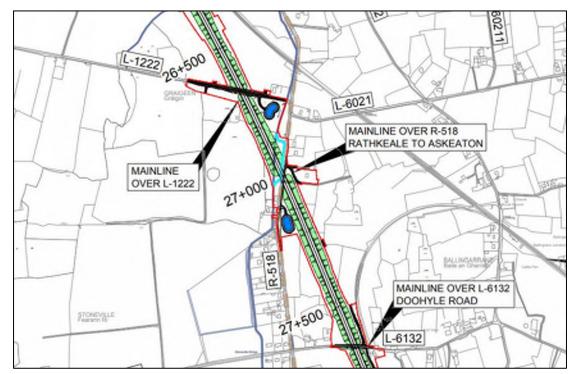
Proposed Road Layout at Graigeen (as per November 2018 Design Update)
